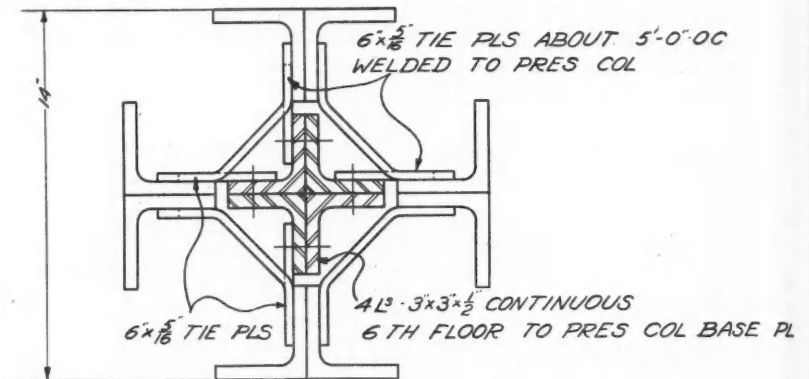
Details of Welded Connections of Tie Plates to Old Columns and New Reinforcements.
